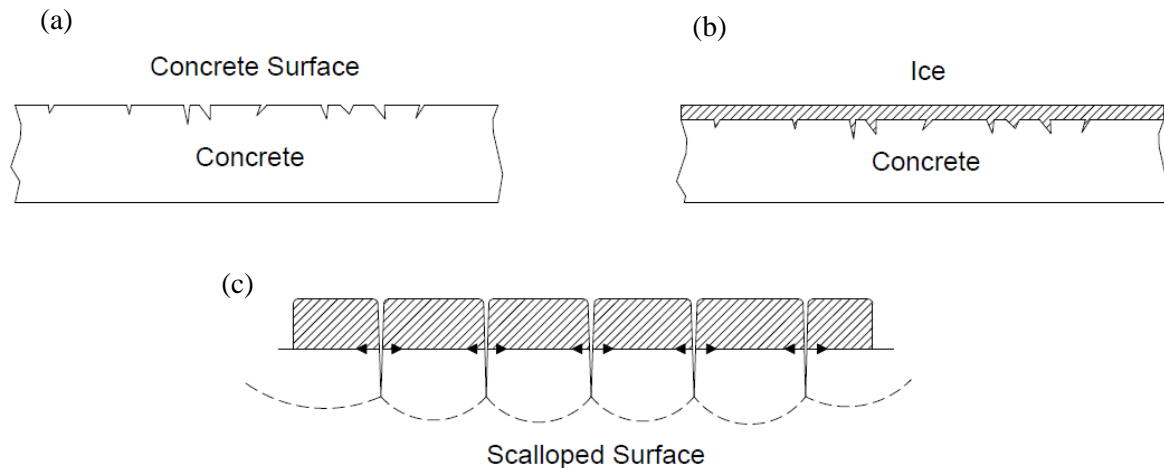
Process for glue spalling (a) concrete surface before ice formation,; (b) concrete surface after ice formation and; (c) ice contracting pulling the concrete away from the surface and causing it to shear (Valenza & Scherer, 2006)
